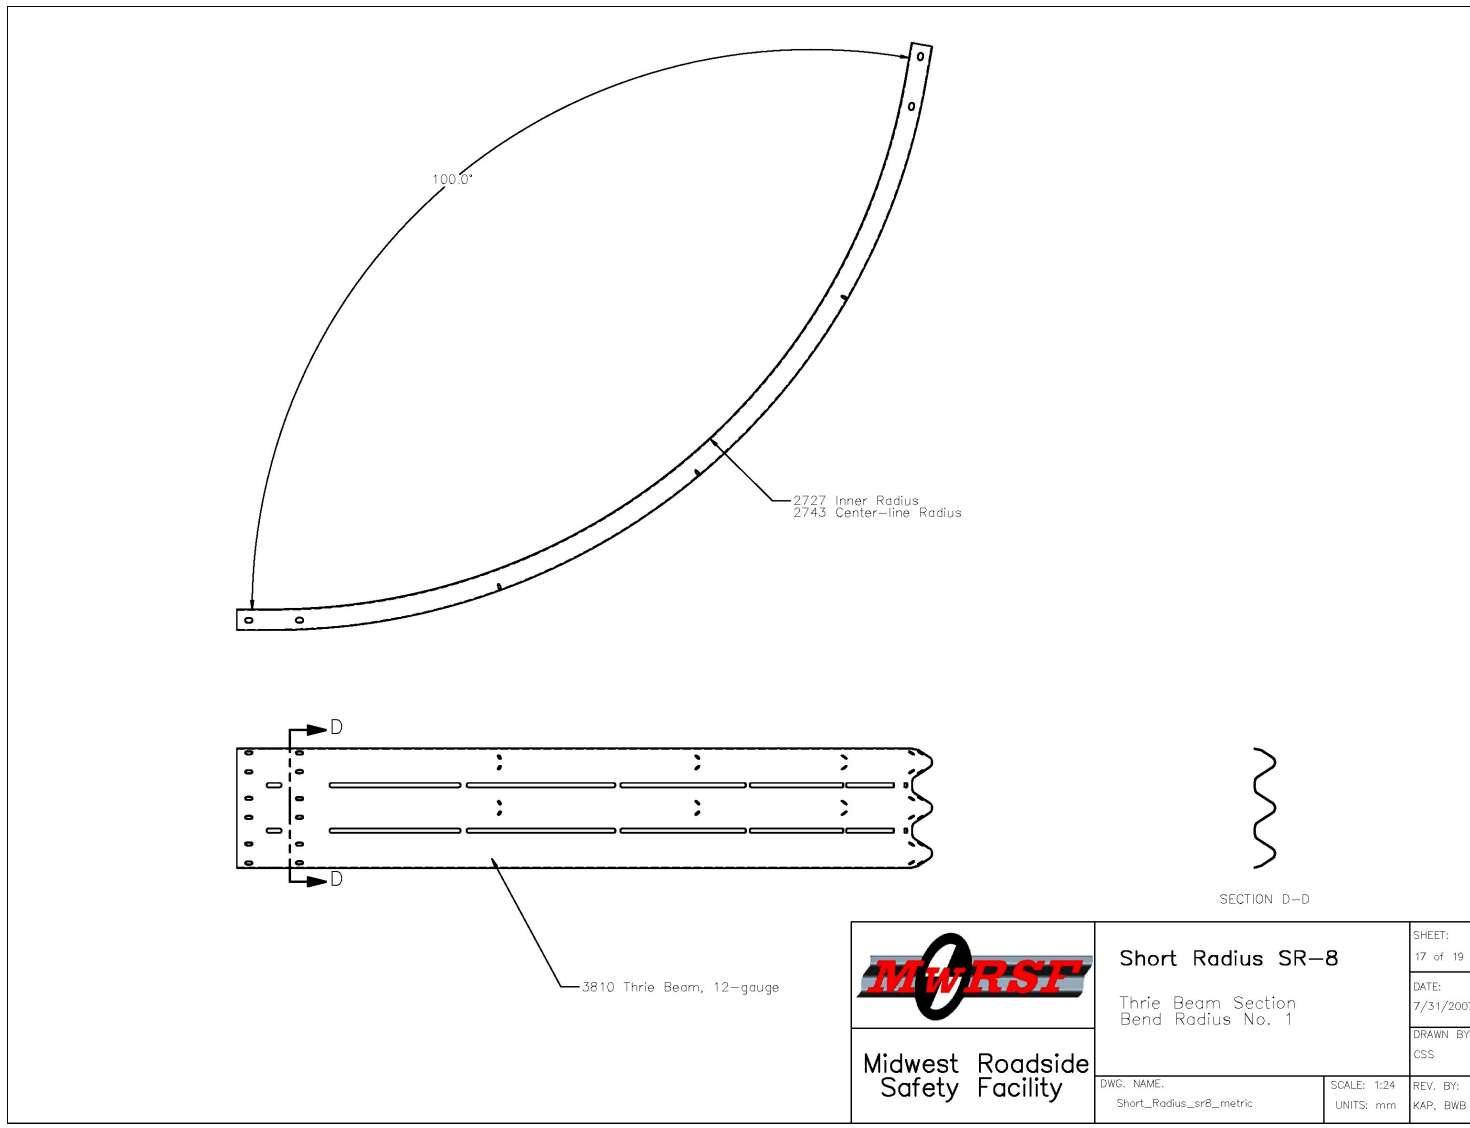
Thrie Beam Section, Bend Radius No. 1
